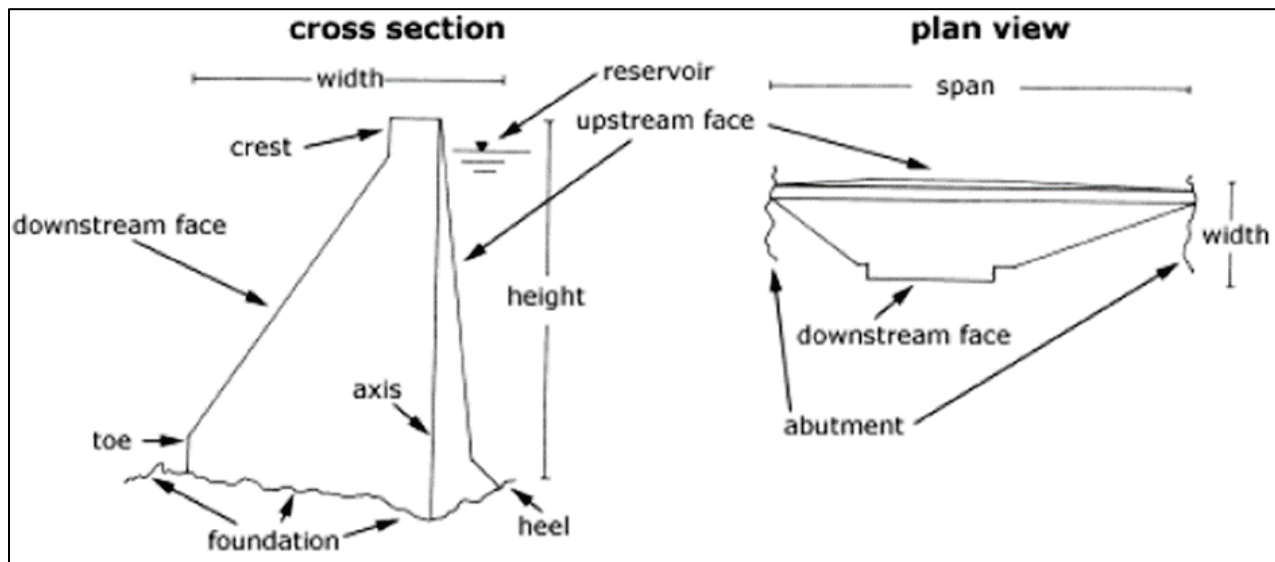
Concrete arch dam plan and profile views (USFS and FEMA 2016).
